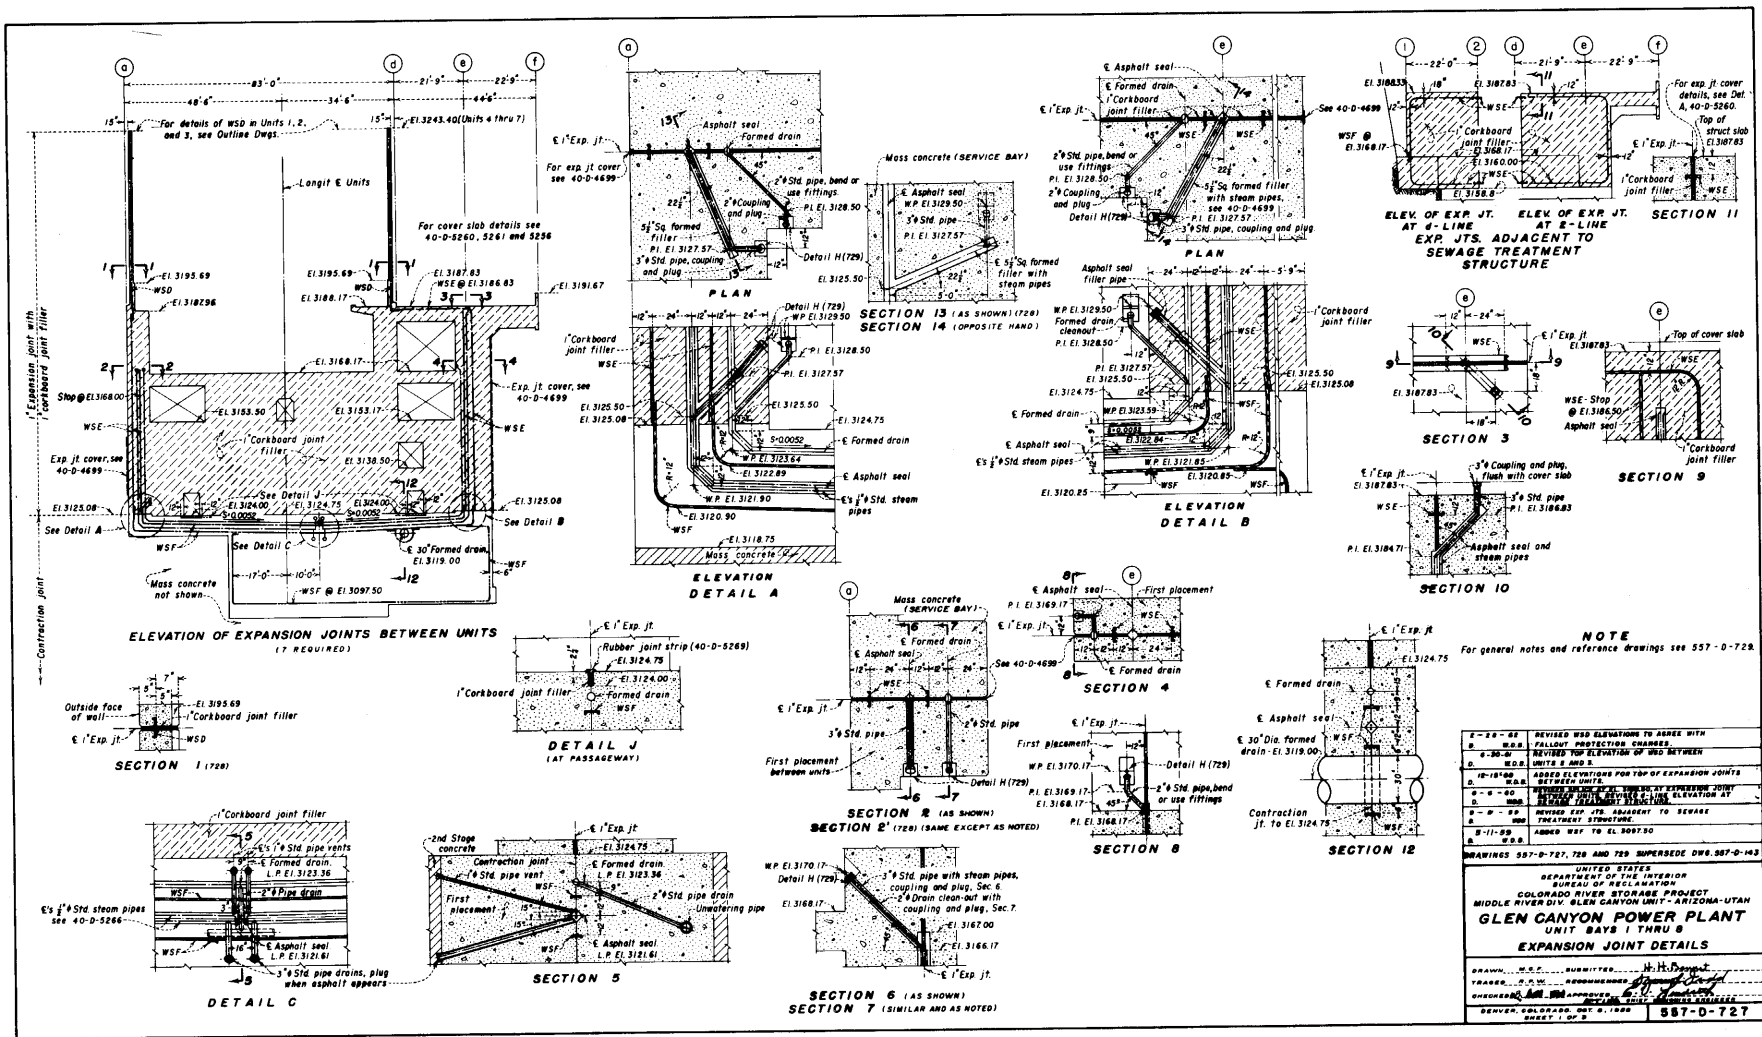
Powerplant expansion joint details—Unit bays 1 through 8.
